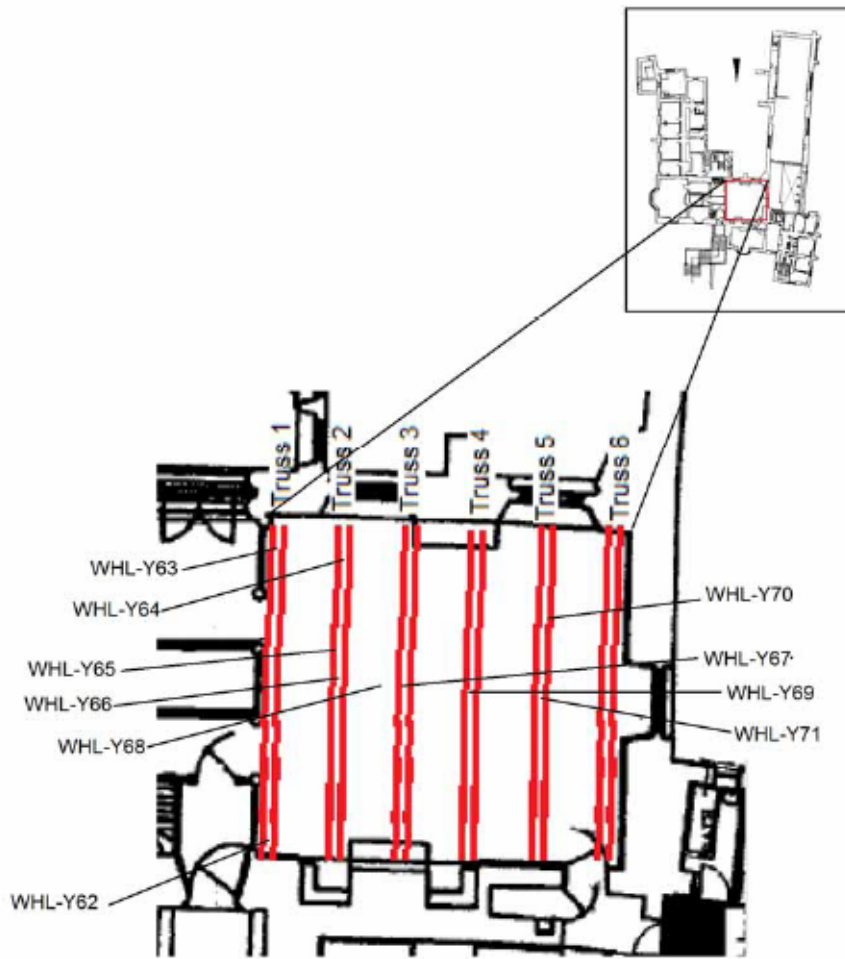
Plan of the great hall, showing the location of samples WHL-Y62–71 (Ashworth Burke Partnership)
